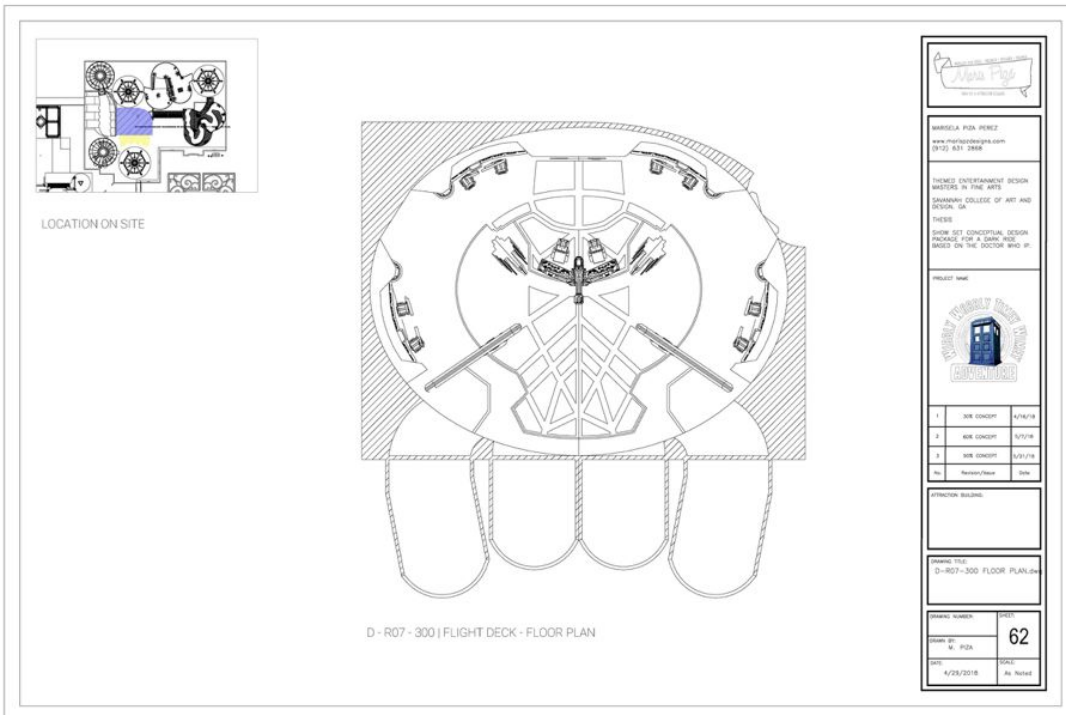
D-R07-300 | Flight Deck - Floor Plan
